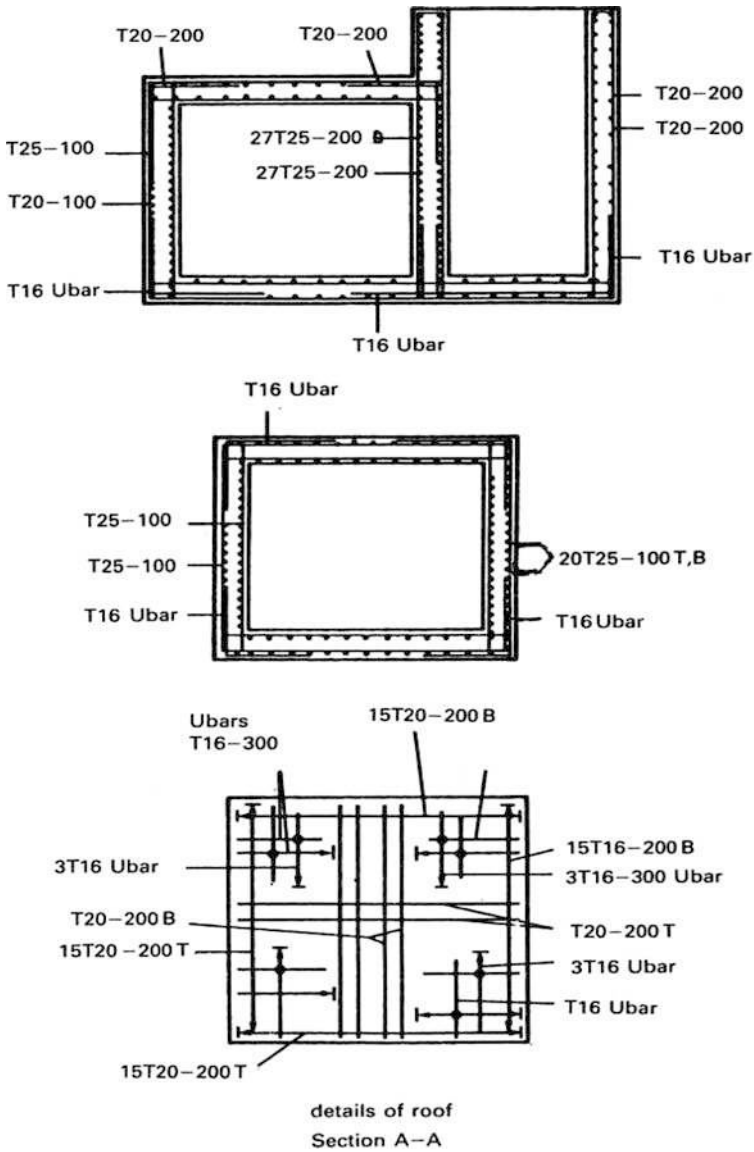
Domestic nuclear shelter (reinforcement concrete): detail
